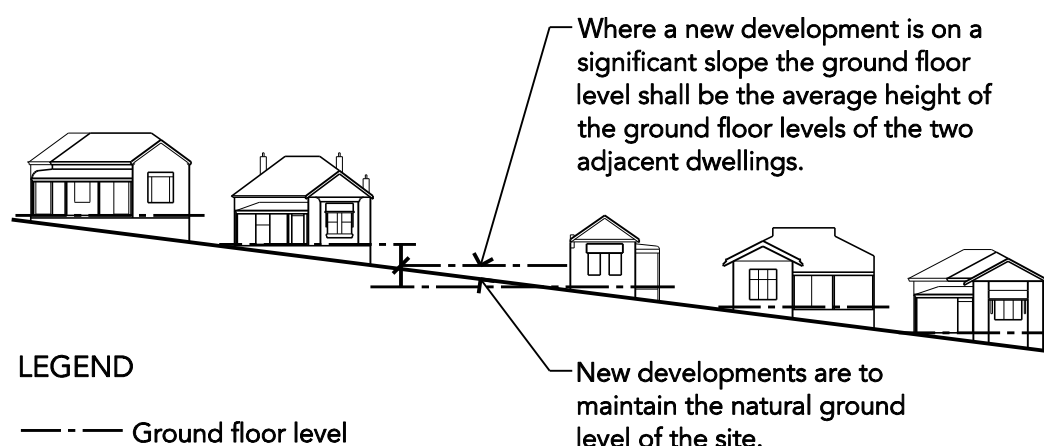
Street elevation illustrating ground floor level for new developments – *Griffiths Architects 2012.
